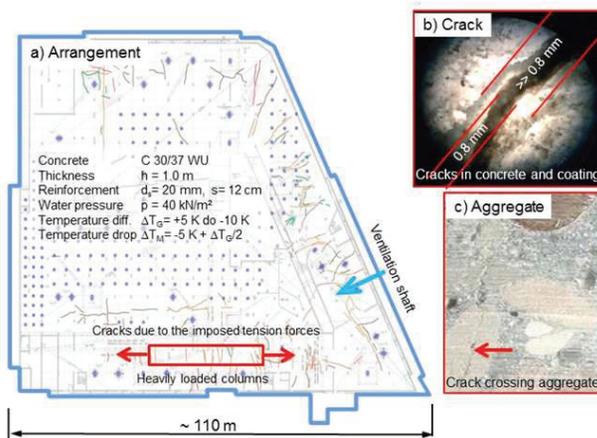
APPLIANCE, Bottom Slab in an Underground Parking Lot
